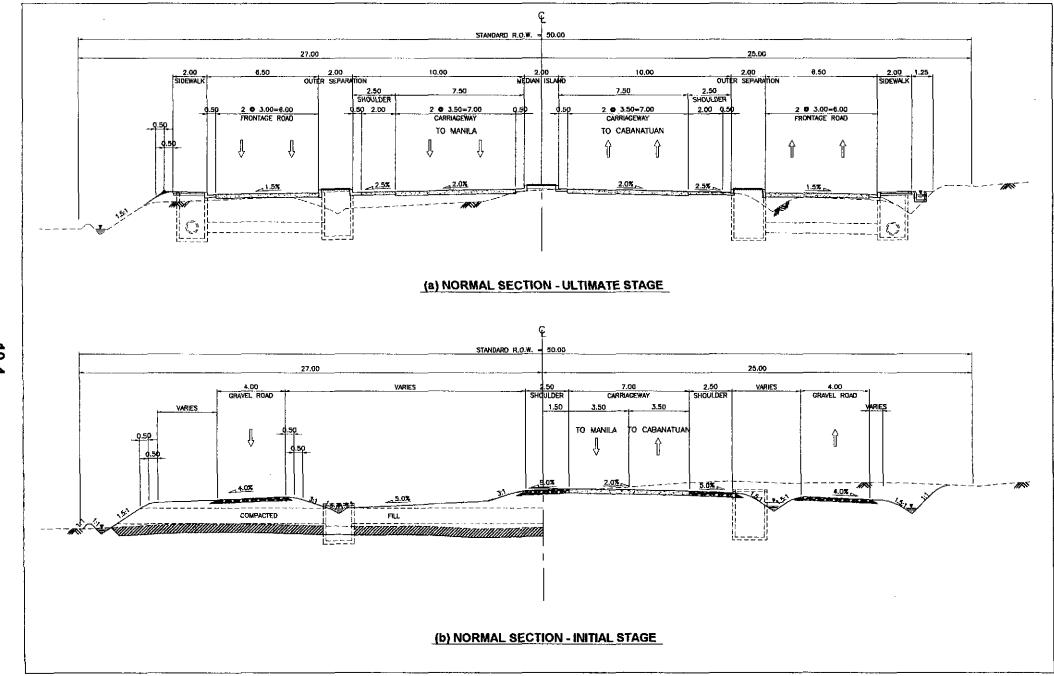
(1) TYPICAL CROSS SECTIONS - WITH FRONTAGE ROAD (CABANATUAN BYPASS)
